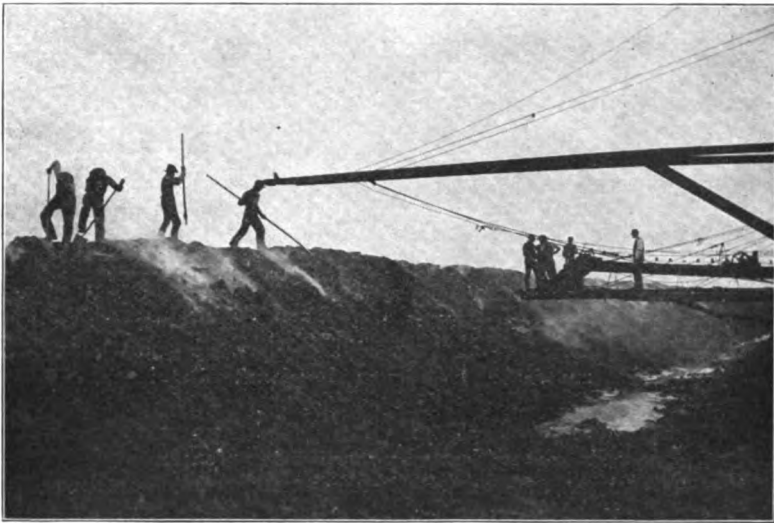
MACHINE FOR LOADING BURNT CLAY BALLAST.
